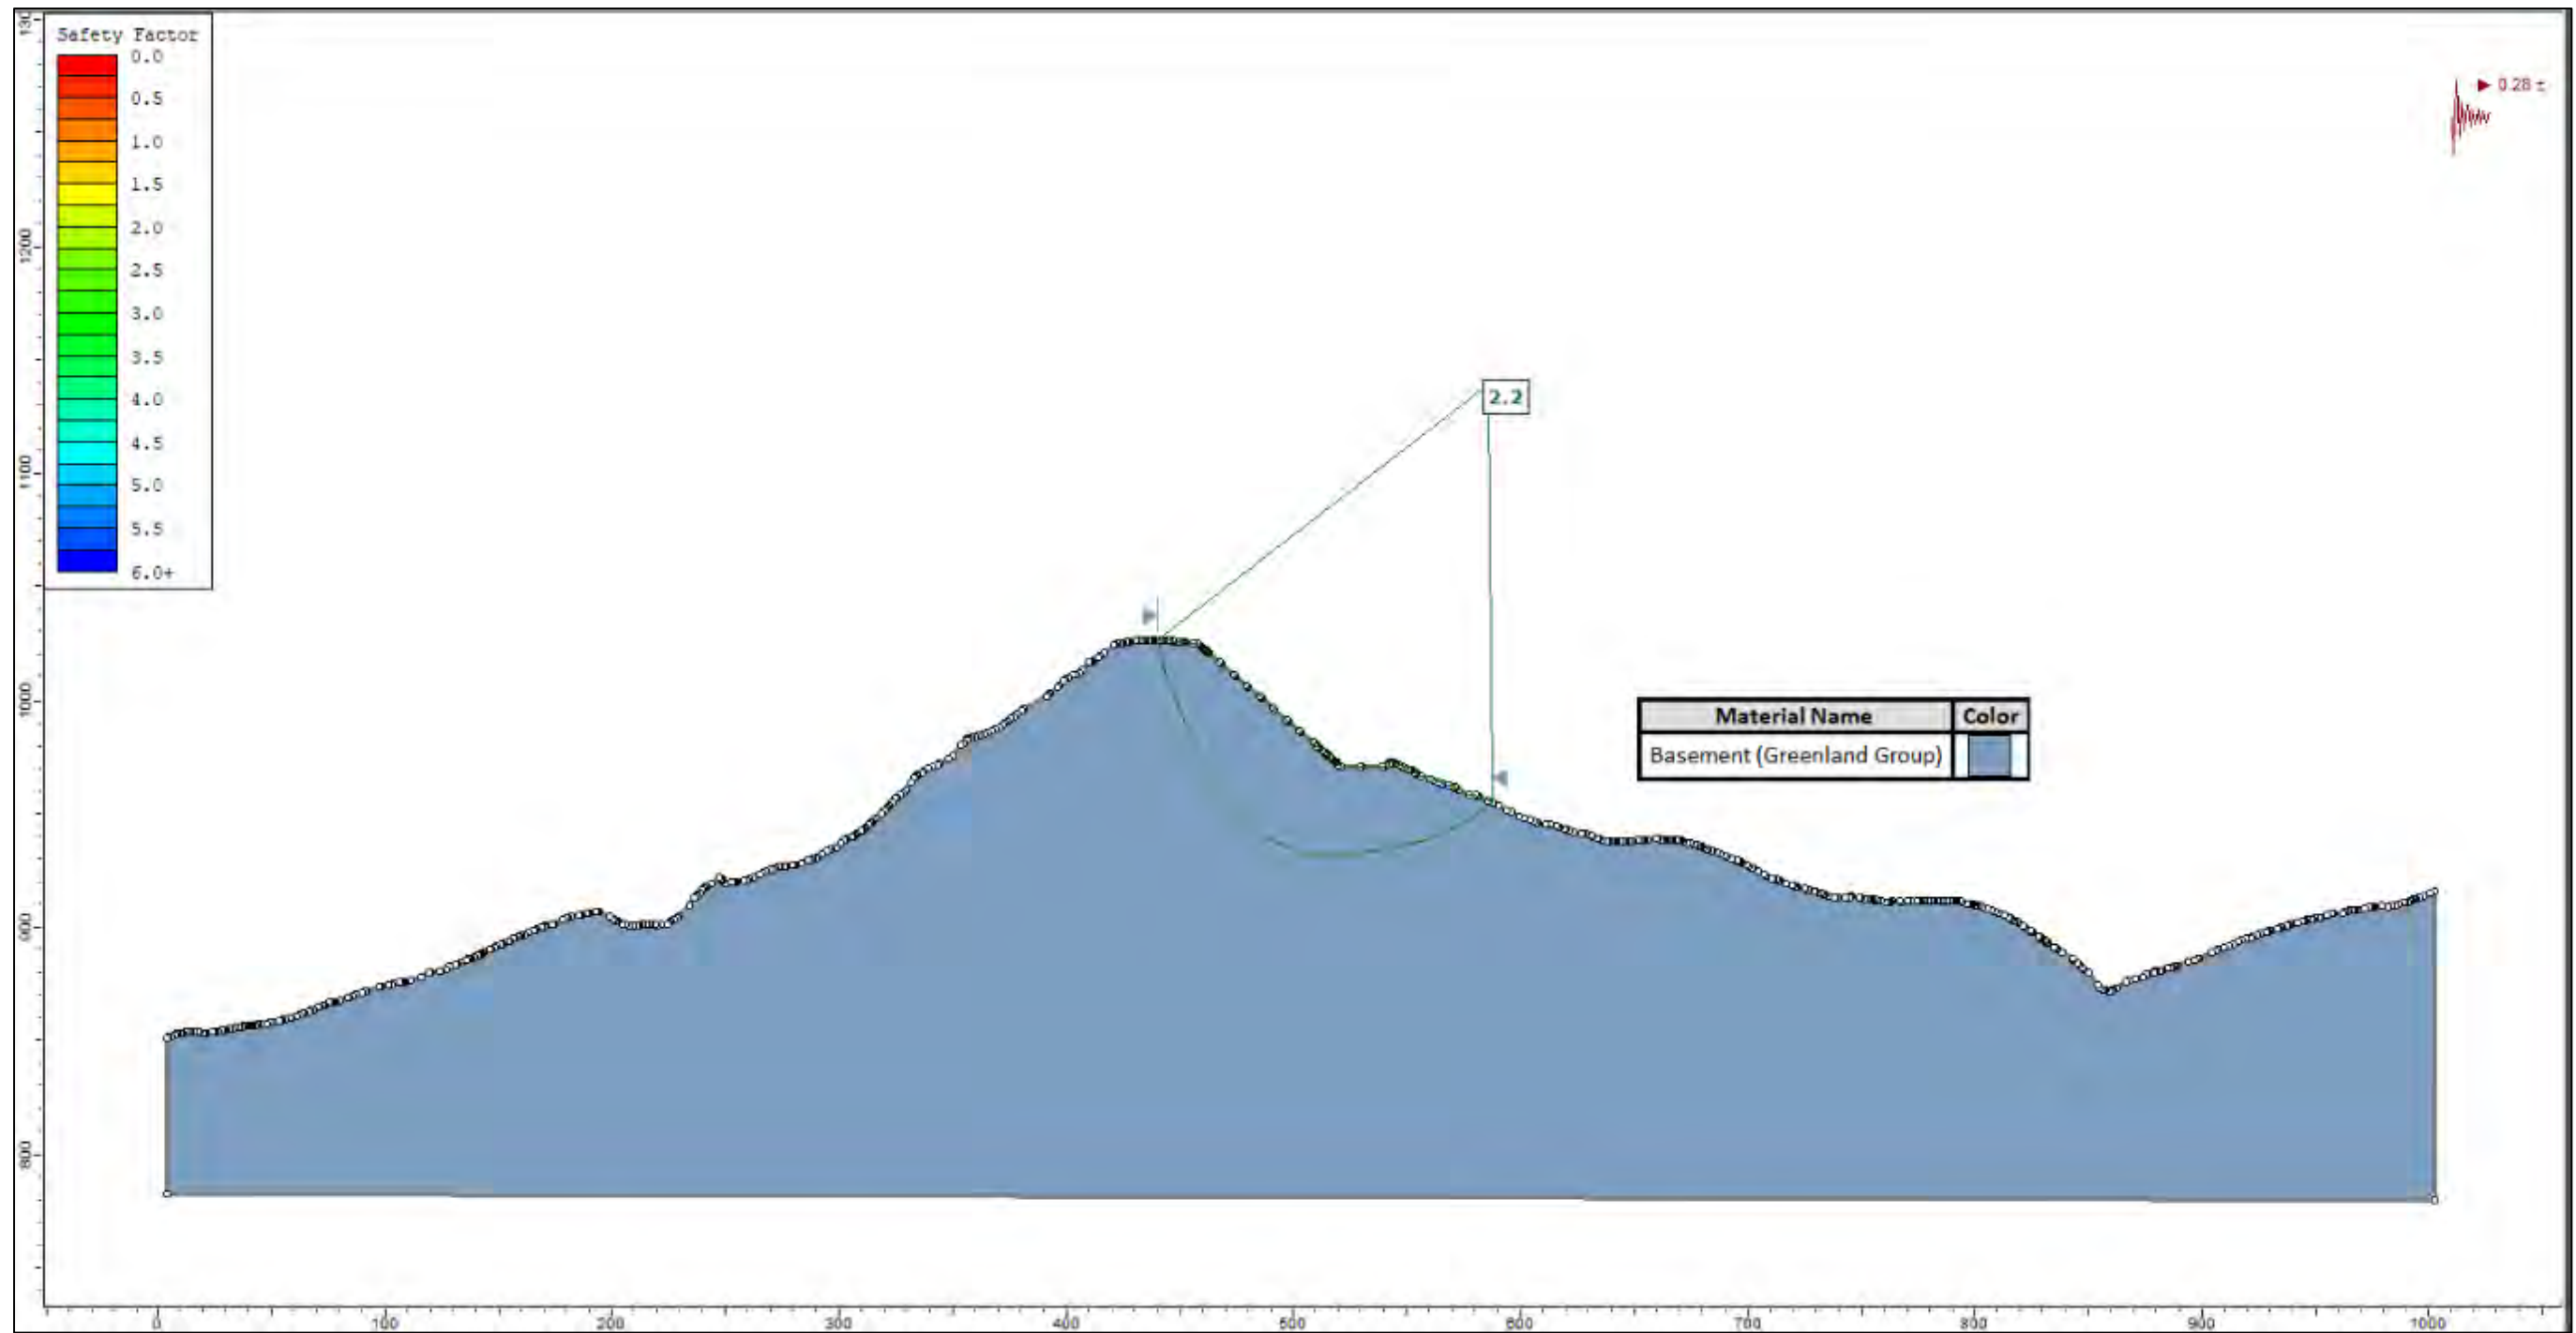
Haul Road Cut - Section 107 – SLS Conditions.
